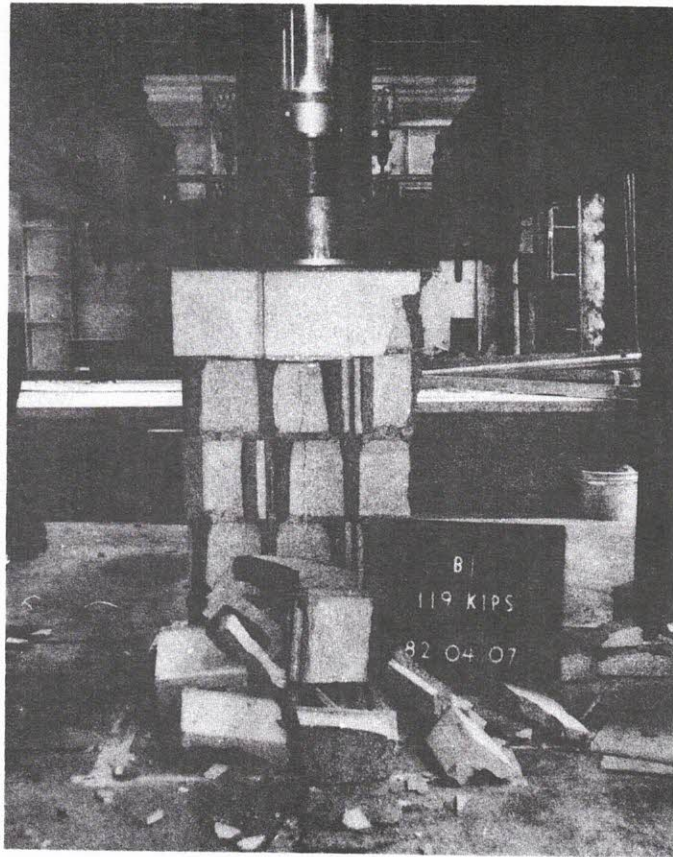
TYPICAL FAILURE OF AXIALLY LOADED WALL
